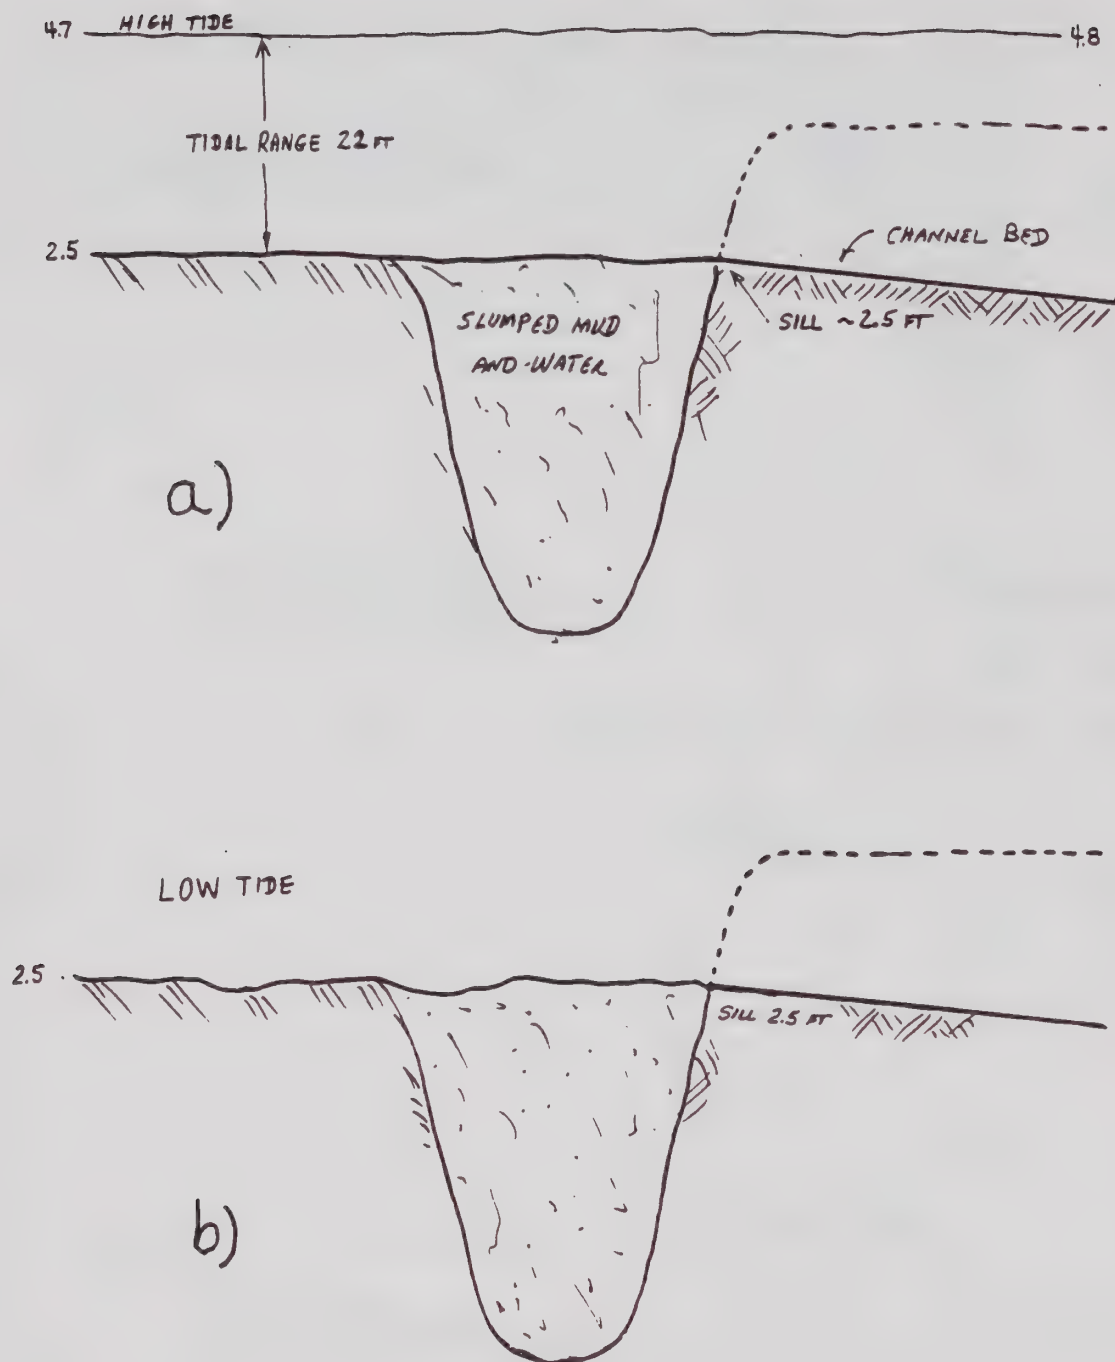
Tidal prism attained with a dredged channel across the high outboard marsh. Highest tide shown in a), low tide in b). sill at 2.5 ft. (Longitudinal section through breach, elevations drawn to scale)
